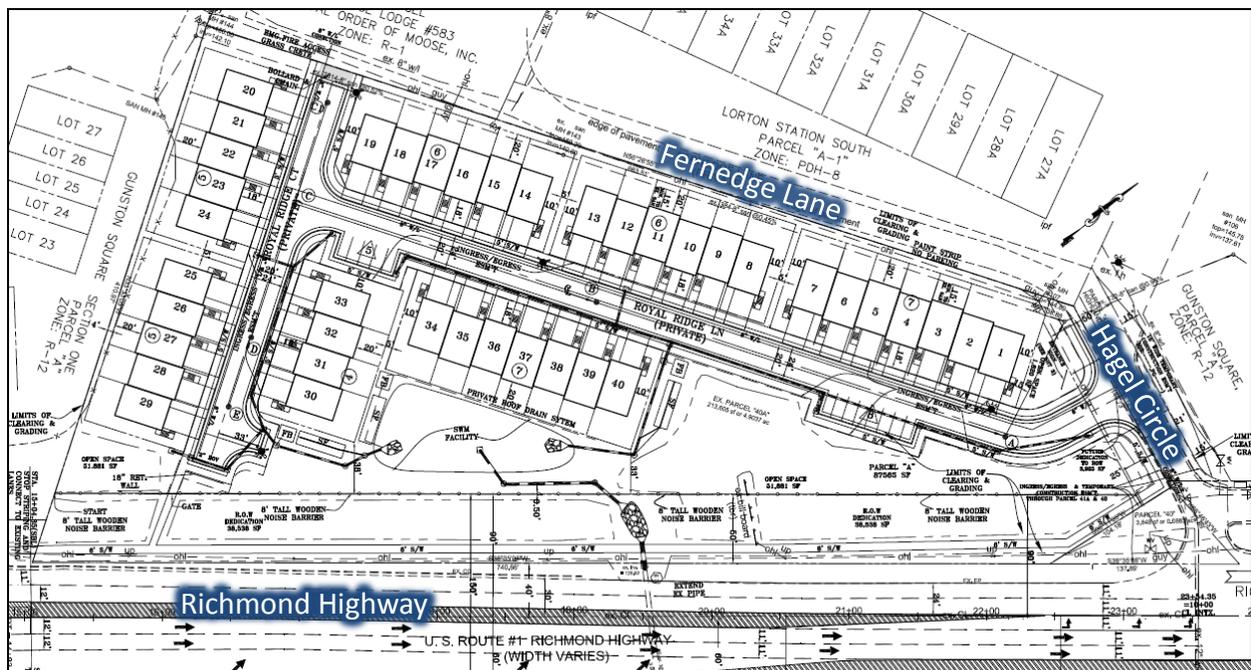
The applicant’s site layout (Source: Soil and Structure Consulting, Inc., 10/8/2014)
